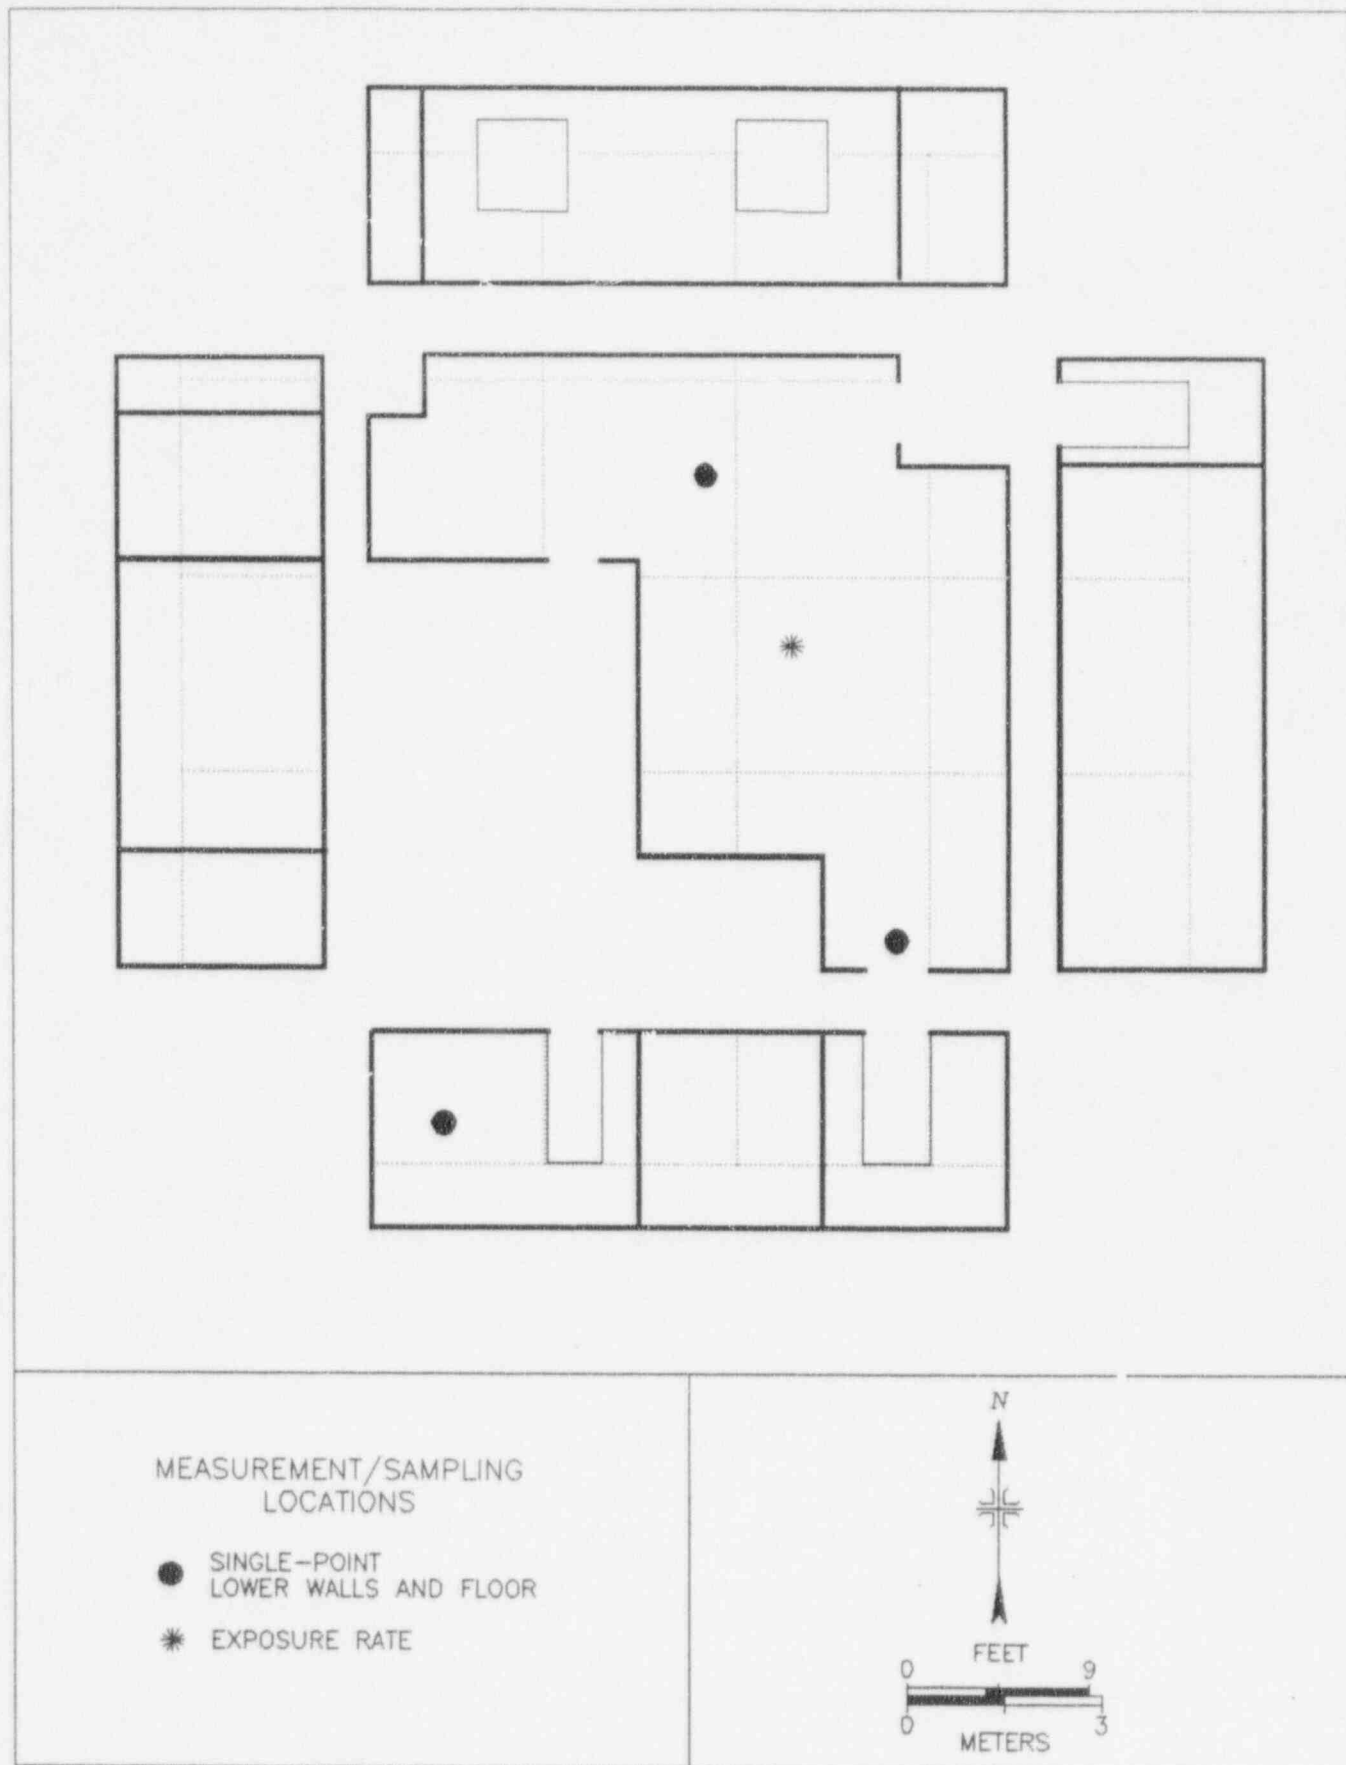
Building 1, Room 3 - Measurement and Sampling Locations
